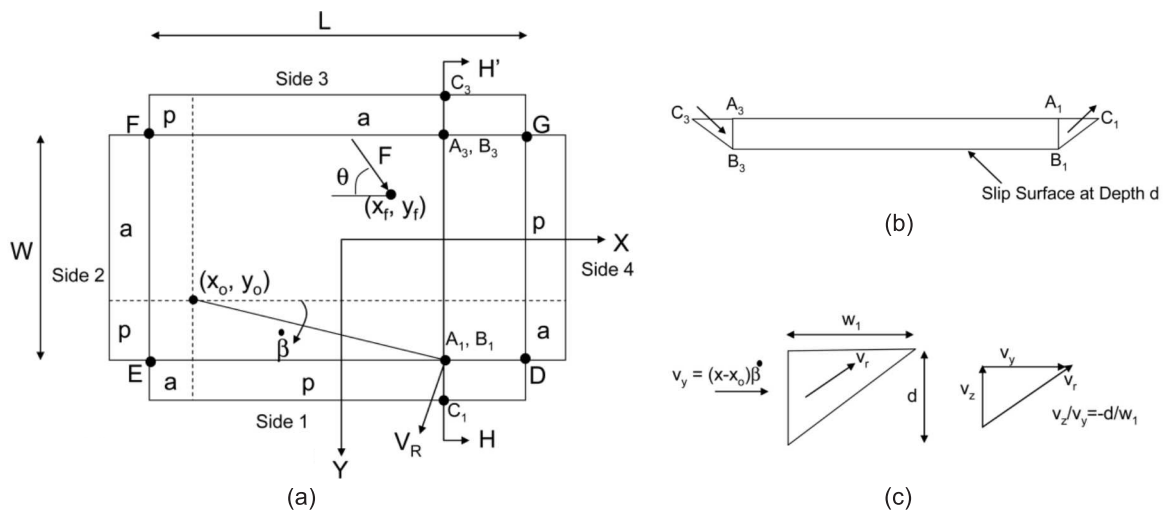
Failure mechanism for a rectangular footing under horizontal and torsional loading as described in Murff et al. (2010): (a) plan view of mechanism; (b) elevation view of section H–H'; (c) elevation view of passive wedge $A_1B_1C_1$
